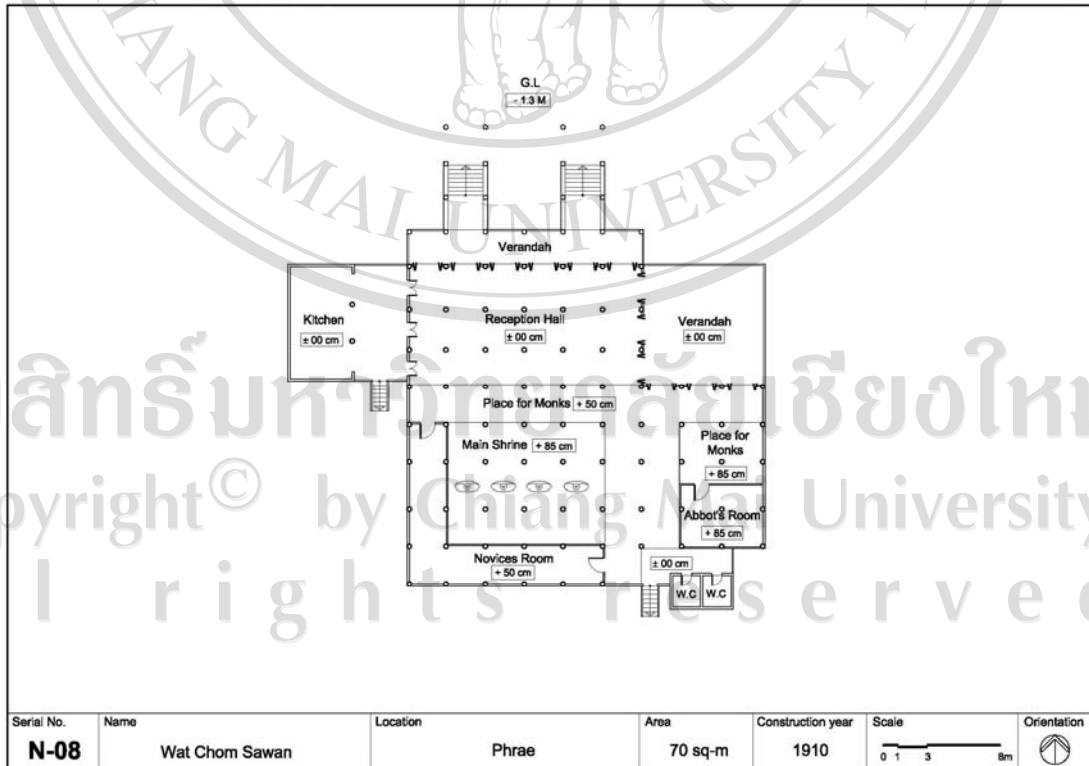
Plan of Wat Chom Sawan, Phrae
